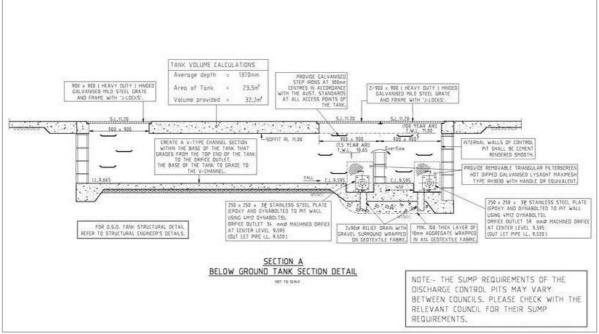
Example Below Ground Tank Layout (after UPRCT, 2005)
